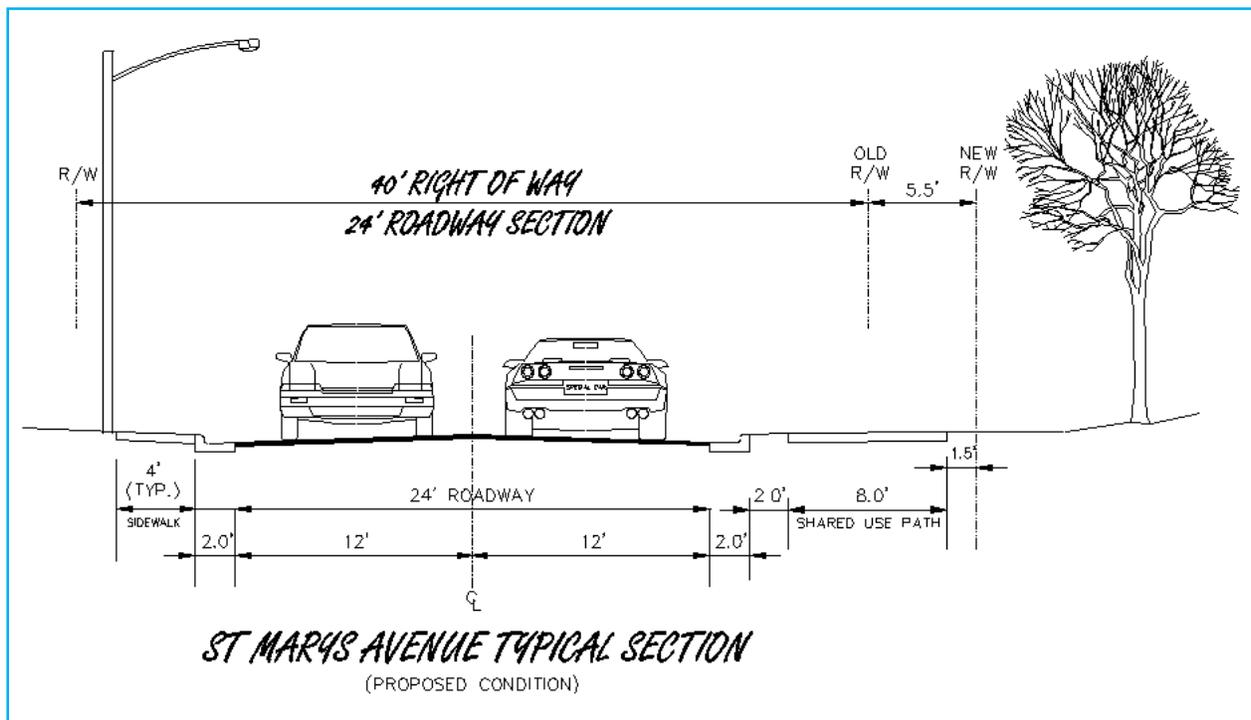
ST MARYS AVE. TYPICAL SECTION – 40’ R/W – 24’ PAVEMENT WIDTH – 8’ SHARED USE PATH
